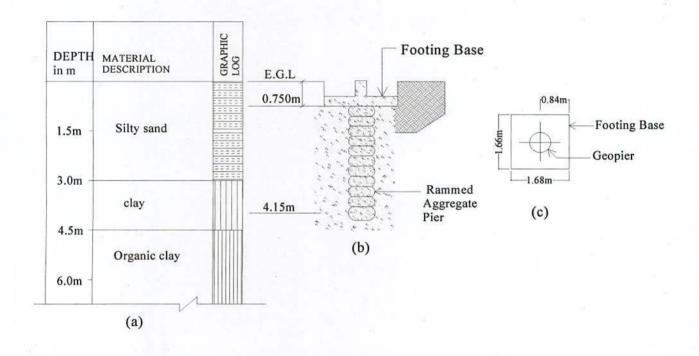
Footing placed on RAP treated ground: (a) Sub-soil profile, (b) Section of installed RAP under footing and (c) Plan of single RAP
